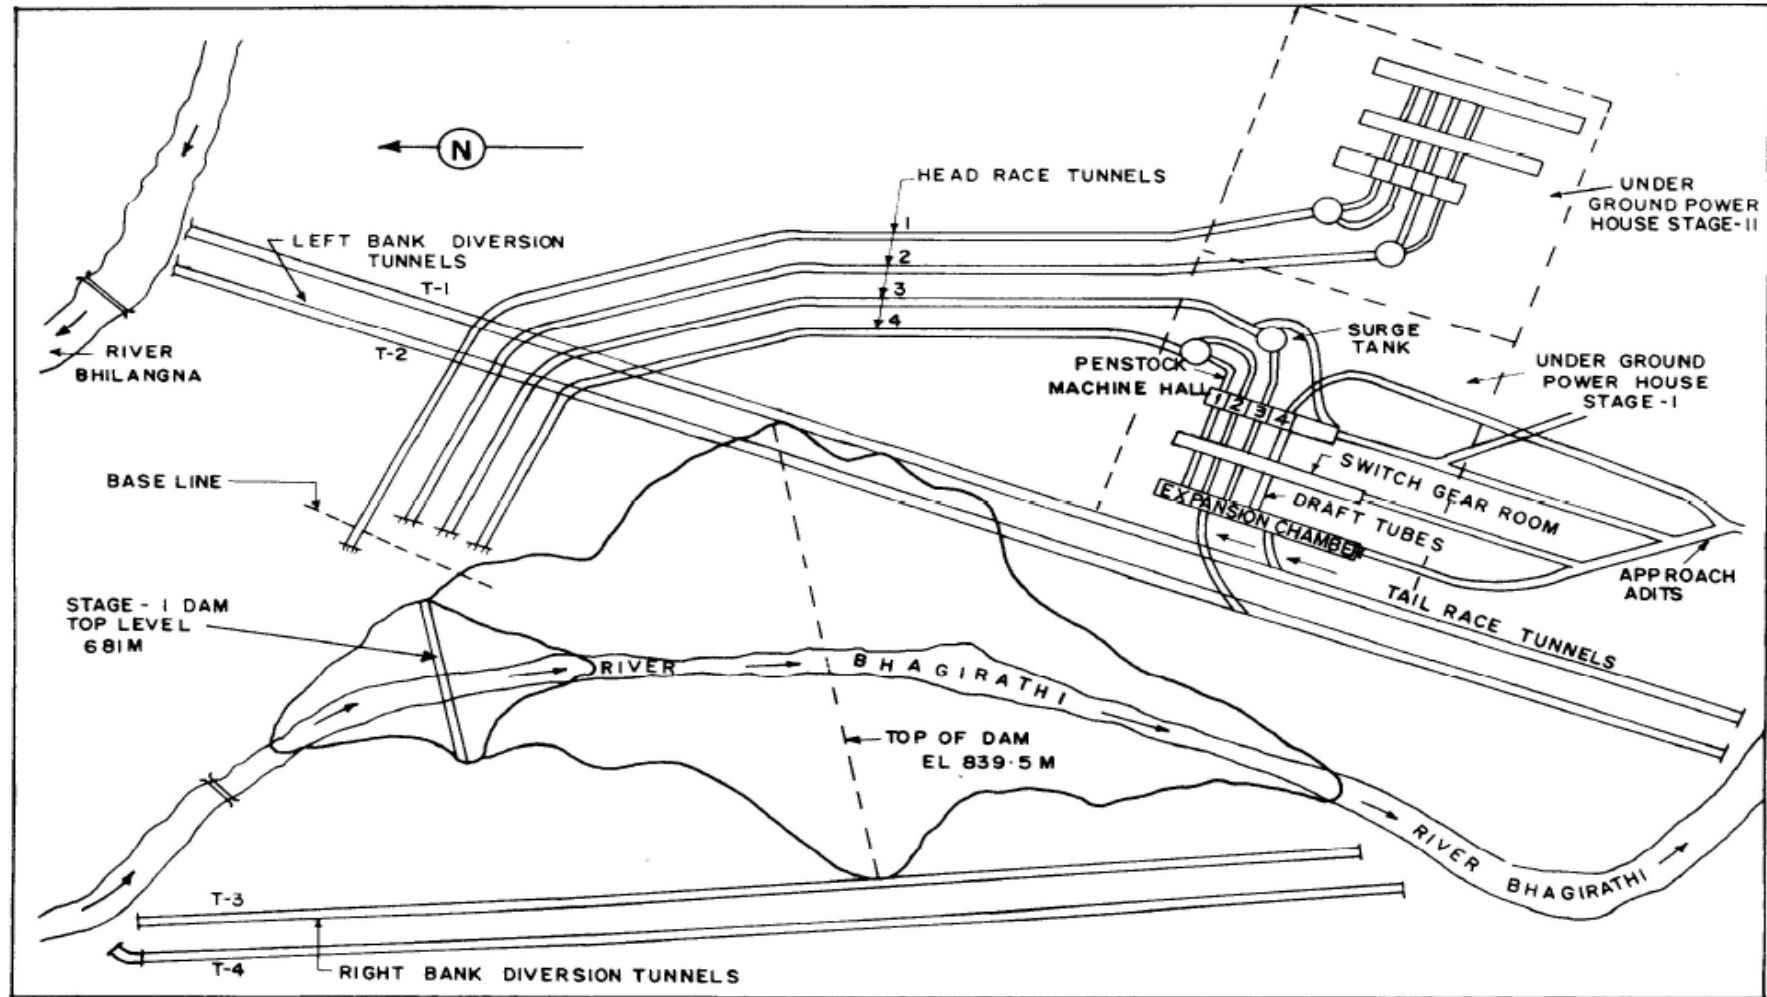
Layout Plan of Tehri Hydro Power Project (after Goel, 1994)
